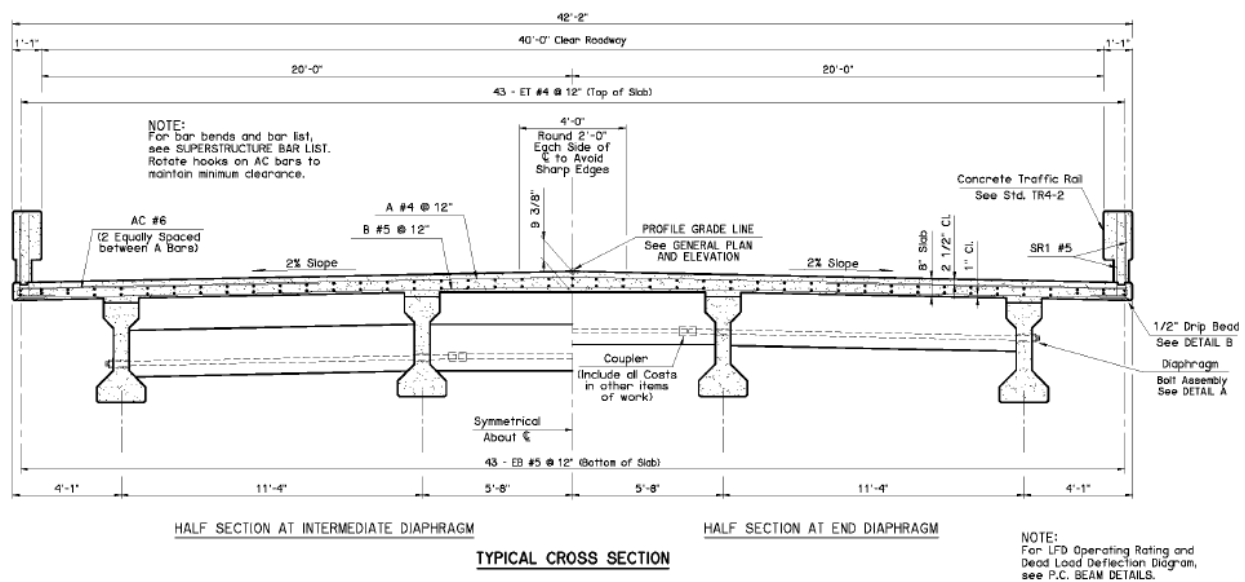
Typical cross-section for Type II, B, III, C, and IV P.C. Beams – (Oklahoma state bridge design standards, 2009)
